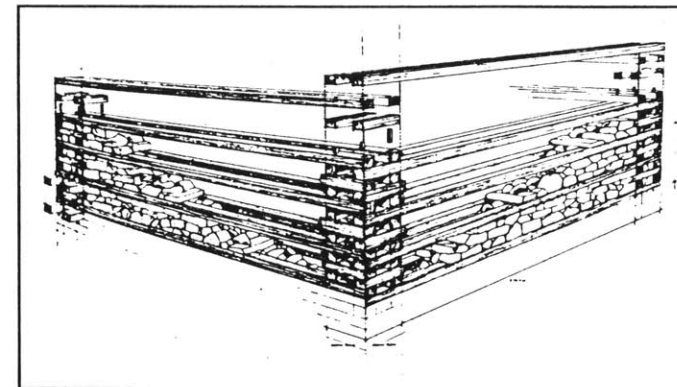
Longitudinal squared timber tie beams are used in the walls.
